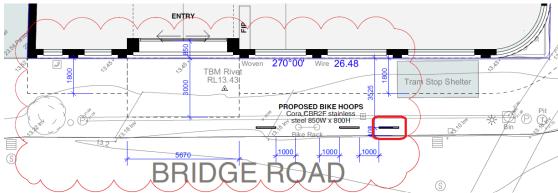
excerpt of the Groundfloor Plan (Decision Plans)
